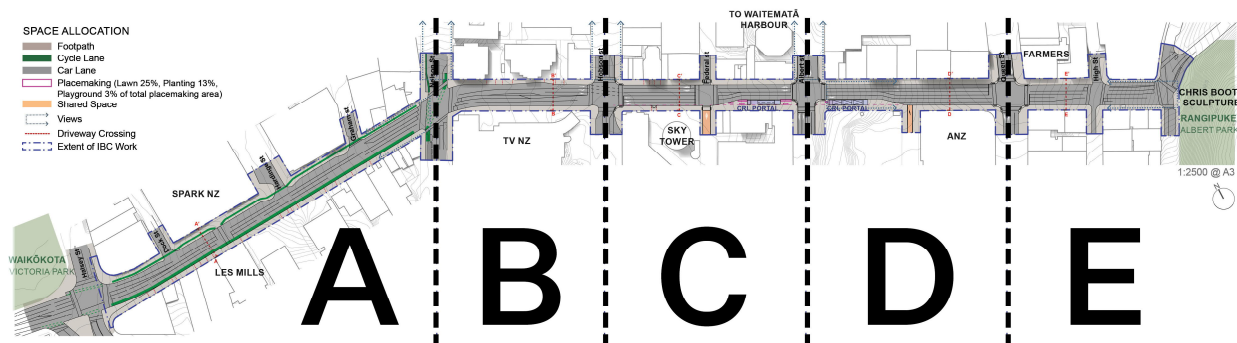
Victoria Street Block Segments (larger image provided in Appendix E)
